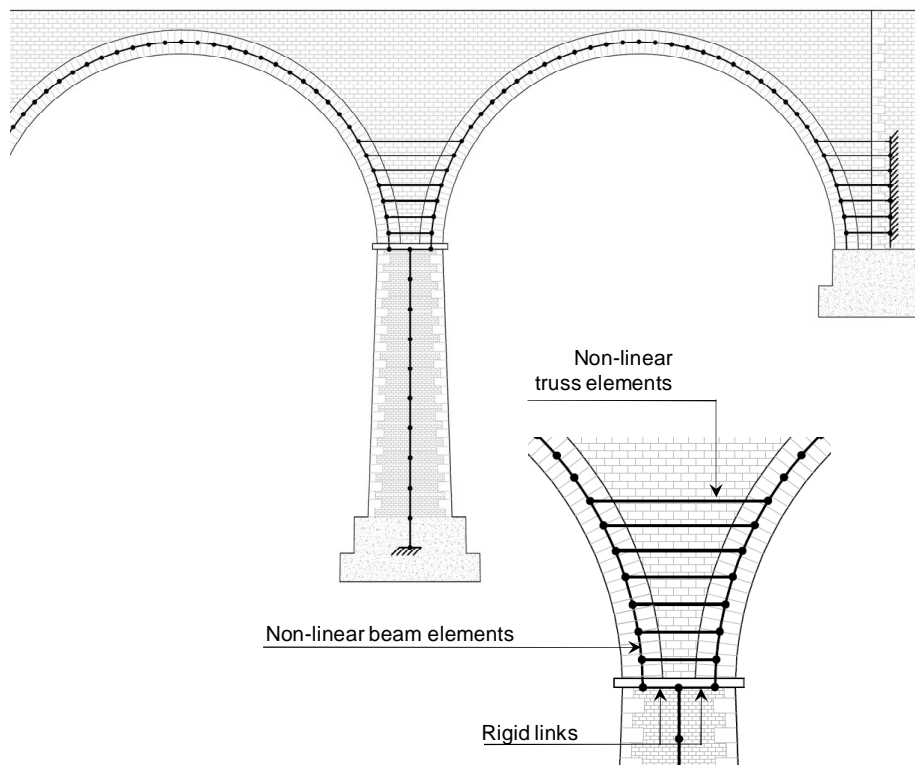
Structural elements of a masonry bridge modelled through 1-D finite elements.
